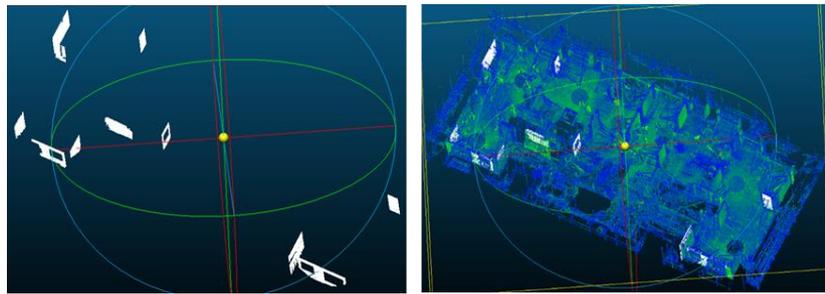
Identified faulty wall planes (left) and their locations in the floor (right).
